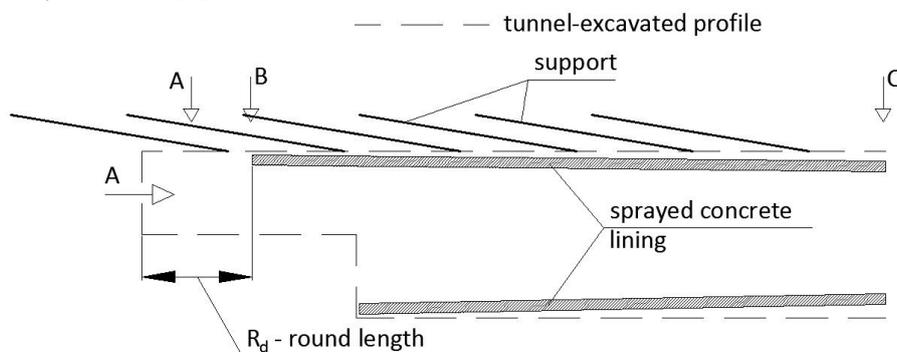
Main components of ground deformations around the tunnel-excavated profile: A – ground movement towards unsupported heading, B – radial ground movement towards the lining and C – radial ground movement towards the lining due to consolidation.
